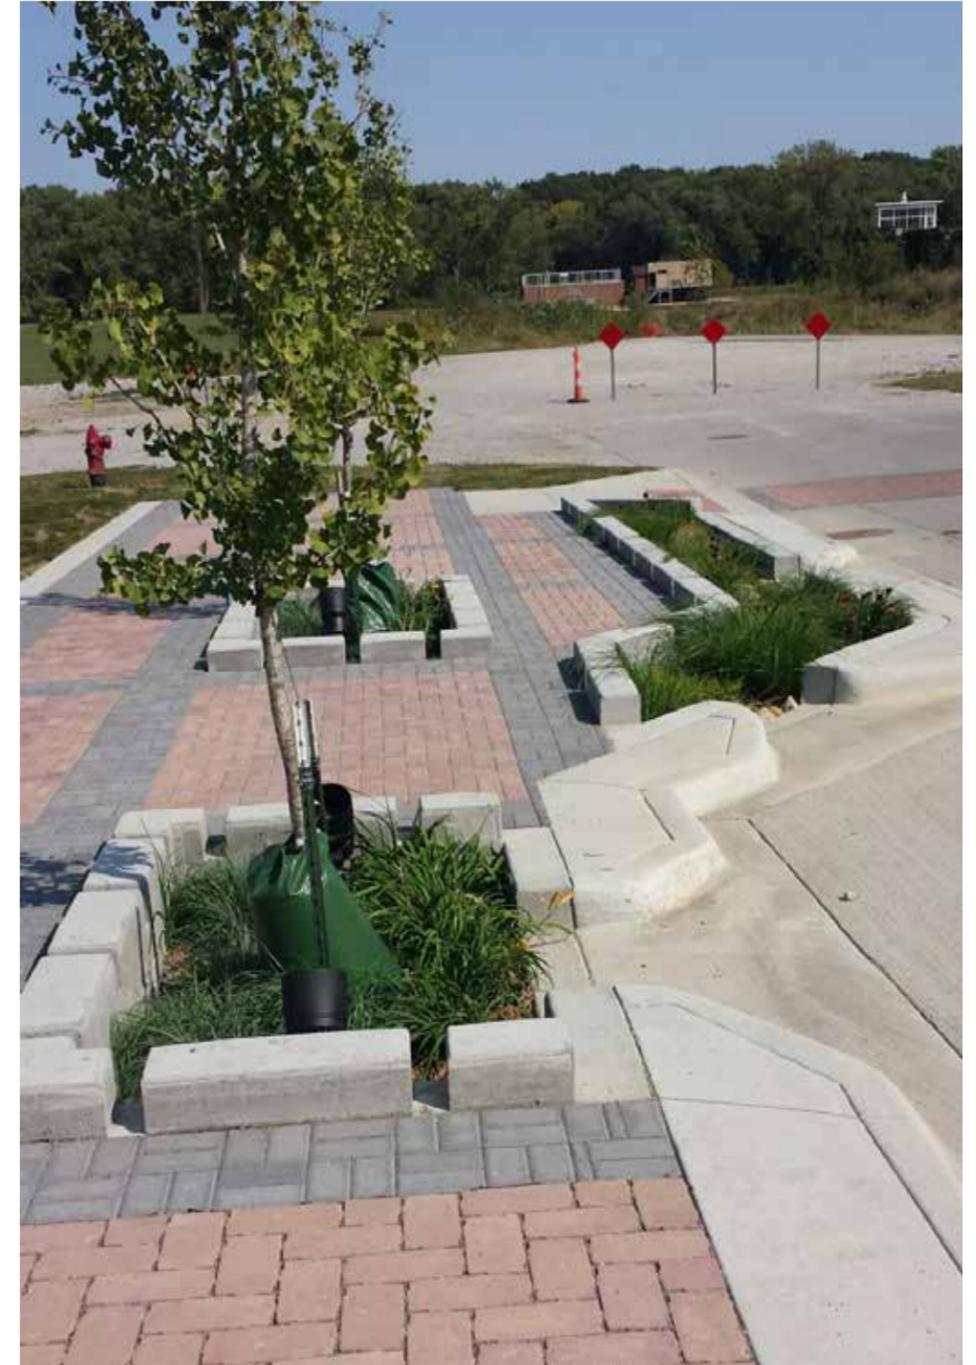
Stormwater planters intercept and filter road and sidewalk runoff during small storms, this example is at Iowa River Landing Place in Coralville. Also visible in the foreground is a permeable paver brick sidewalk.
